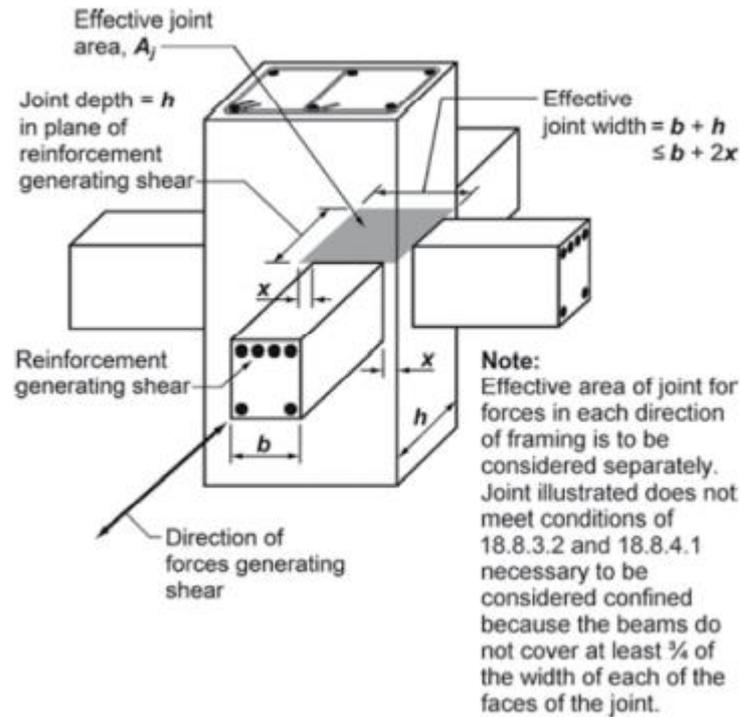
ACI318-14/Fig R18.8.4 Effective Joint Area
